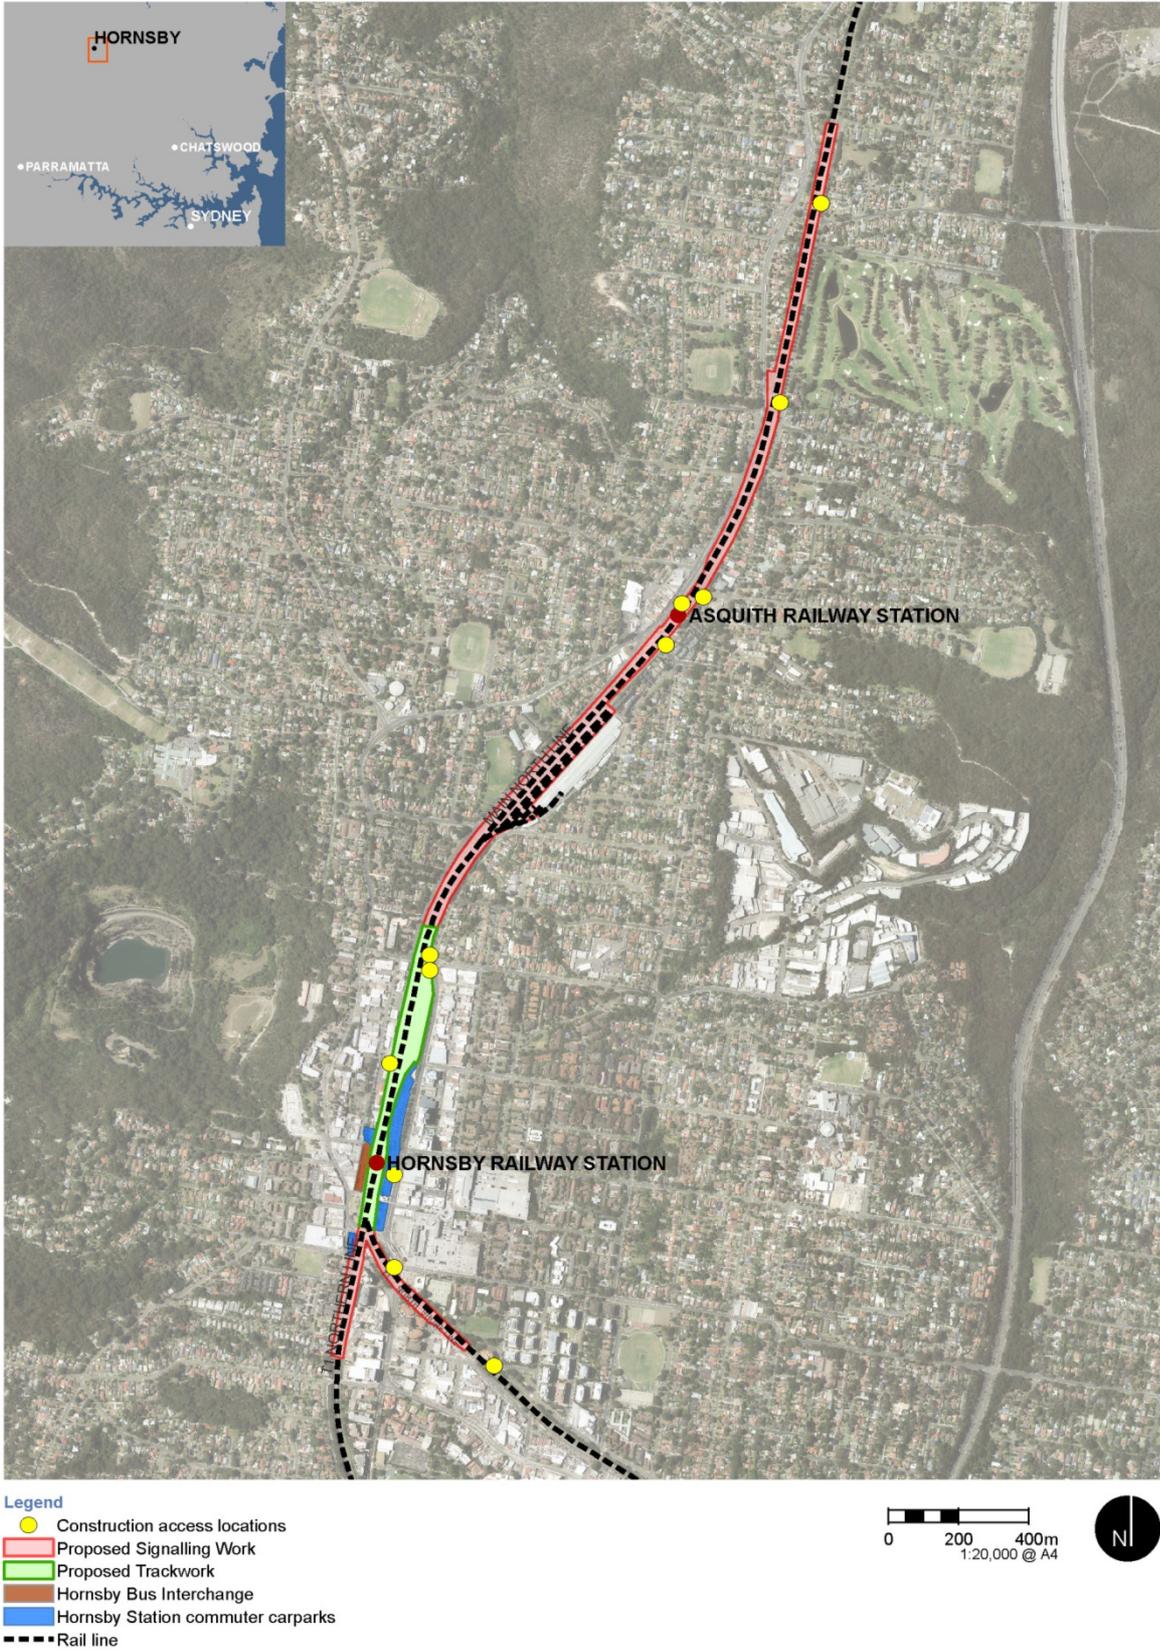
Additional site access locations (Hornsby Junction Remodelling)
